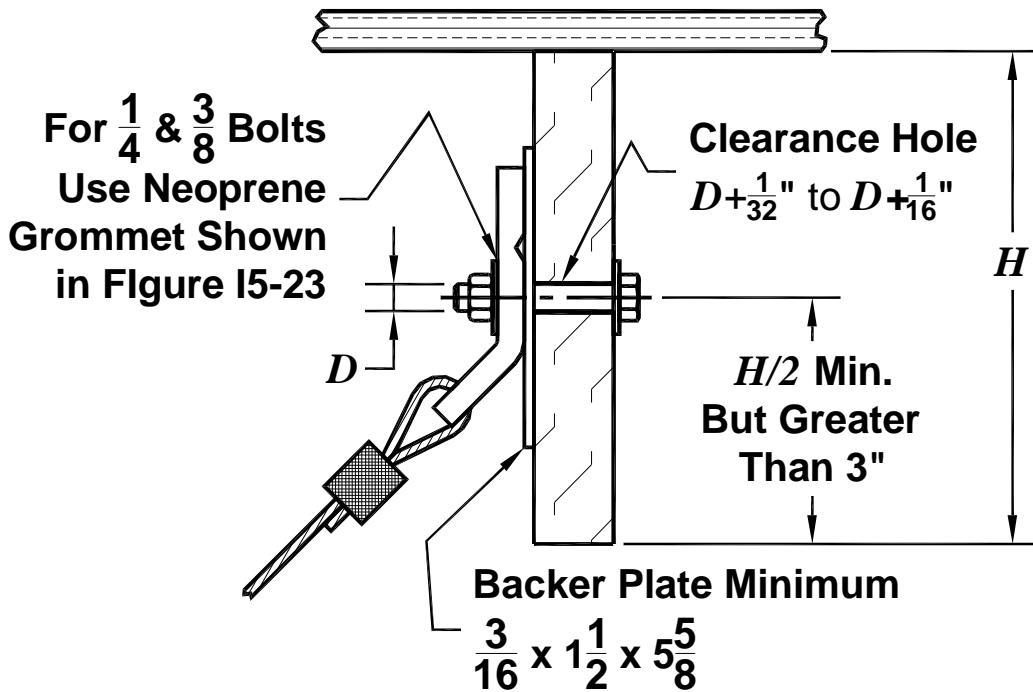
; KSCA Attached to a Wooden Joist or Beam in Orientation 2 Using a Through Bolt
